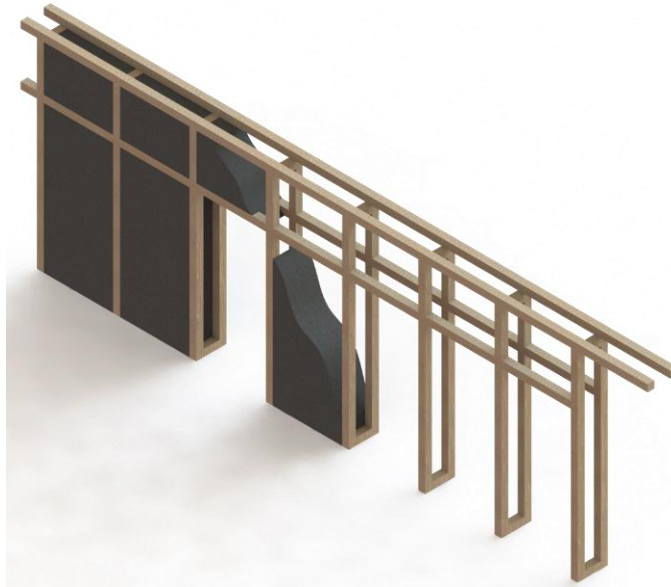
Timber structure based on the drawings of Palyvou K. (Palyvou C 1988) of the ground floor construction “Xesti 3”, without scale [credits Alice Tavares].
